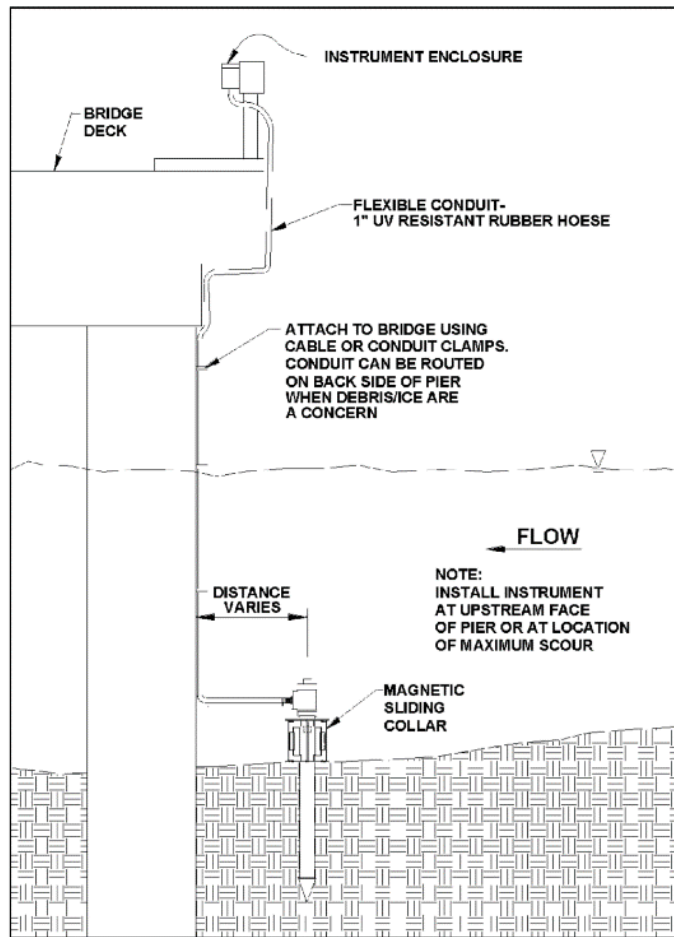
Fixed instrument monitor on bridge (Lagasse et al., 2009).
